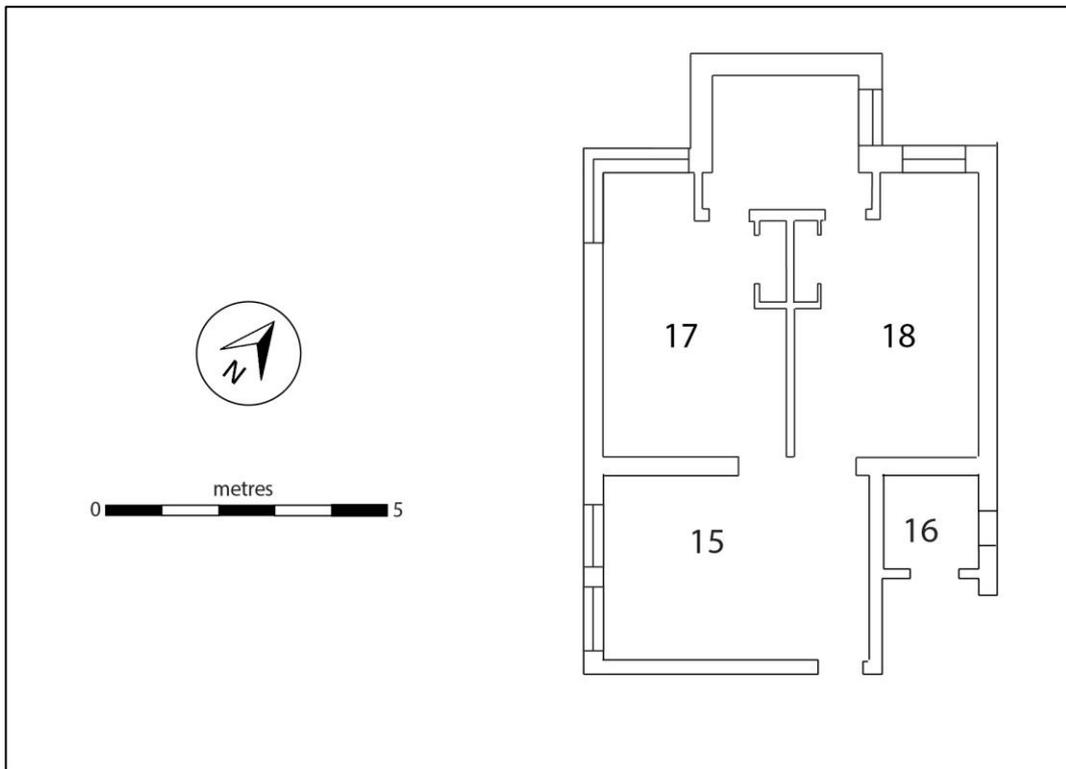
Floorplan of Phase 3 additions. For location refer back to Figure 4-1.
